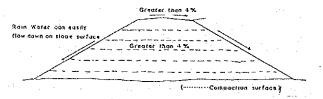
TEMPORARY DRAINAGE DURING CONSTRUCTION OF EMBANKMENT SLOP
